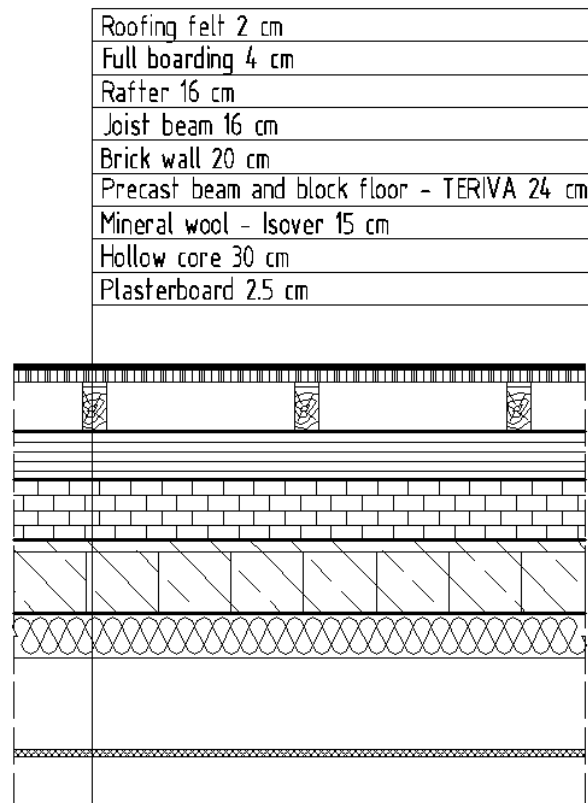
Structure of the roof cross section 4-4.
